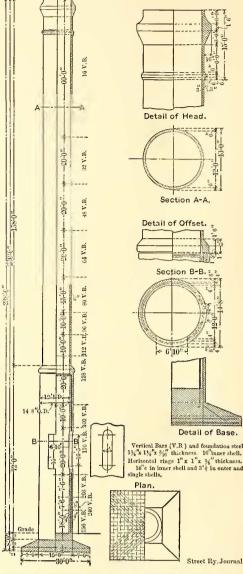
SHOWING PLAN, ELEVATION, SEC-TIONS AND OTHER DETAILS OF CONCRETE CHIMNEY
